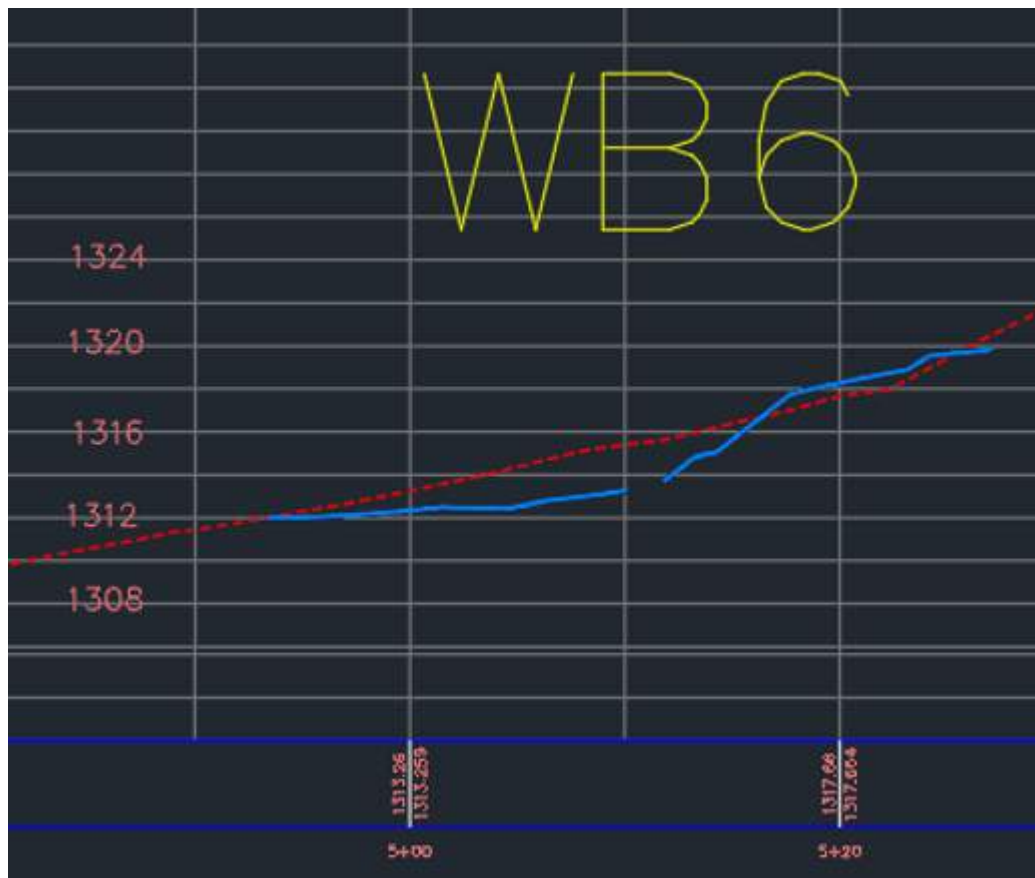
Location 6 Profile View of Existing and Proposed Ground Elevation
